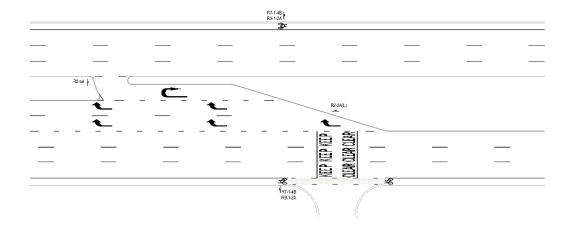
Side Road Access to a Right Turn and U-Turn Facility
